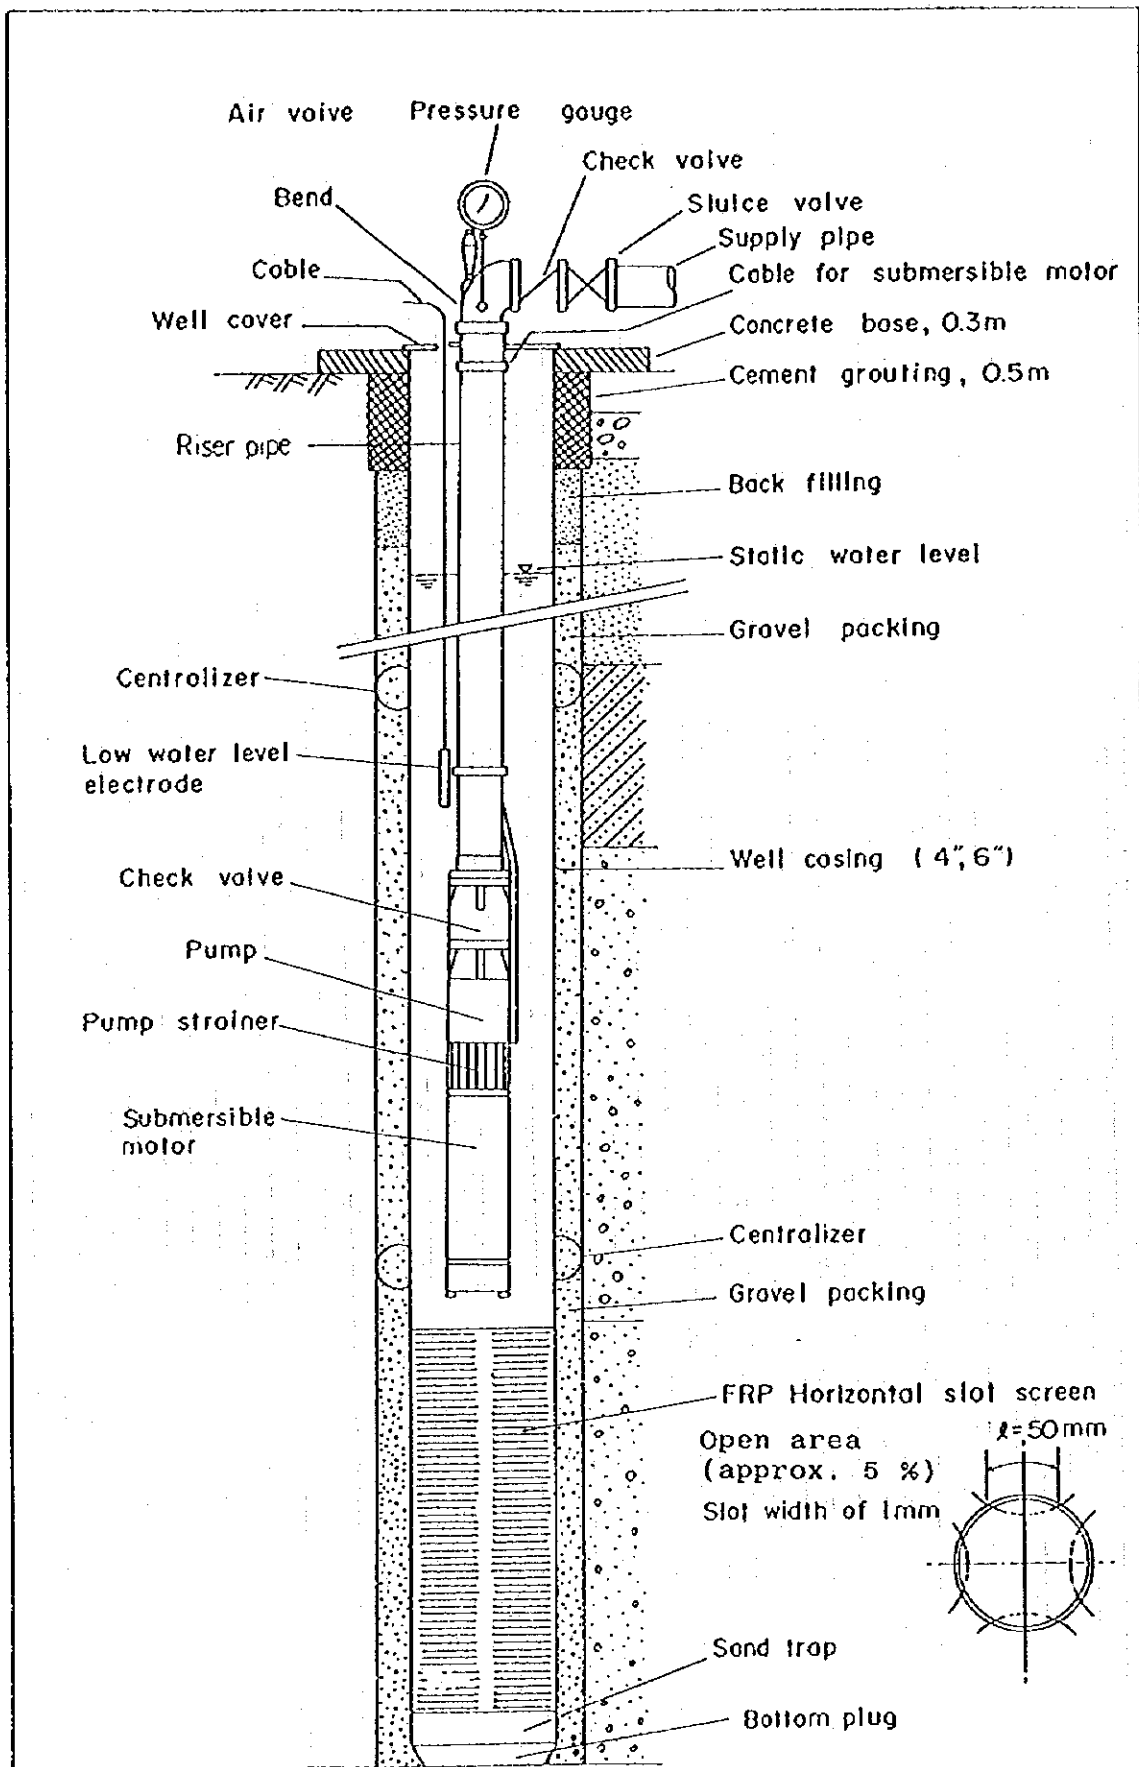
Standard Well Design for Motor-pumped Well
